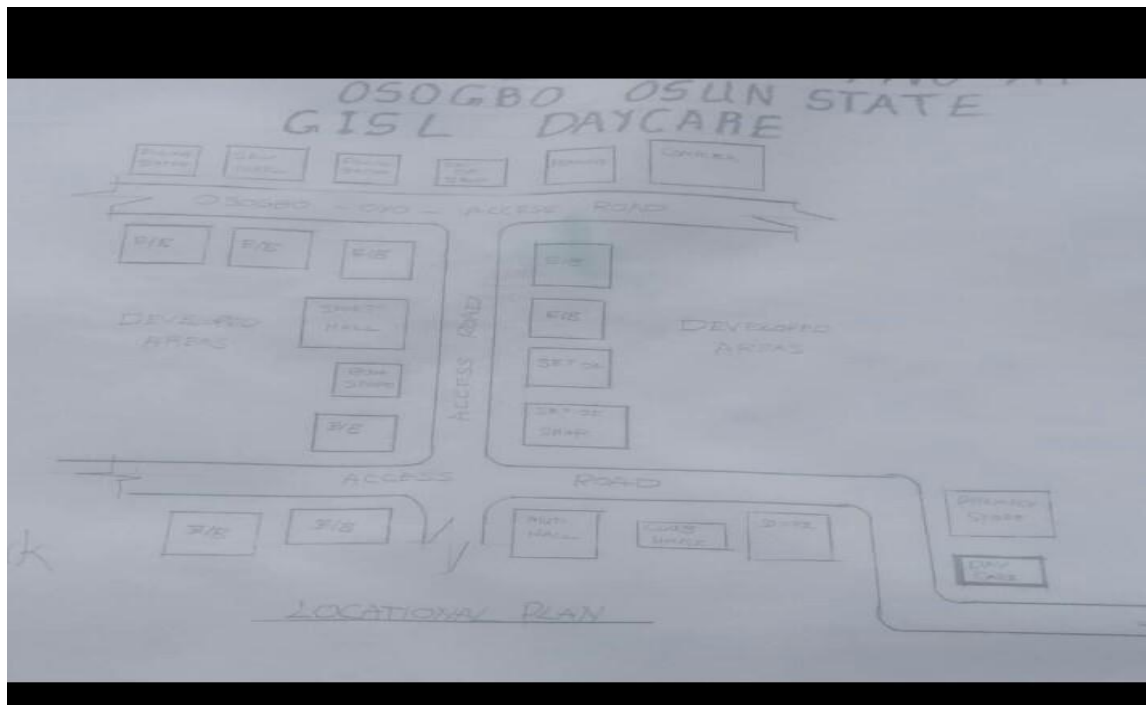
LOCATIONAL PLAN OF CASE STUDY ONE
